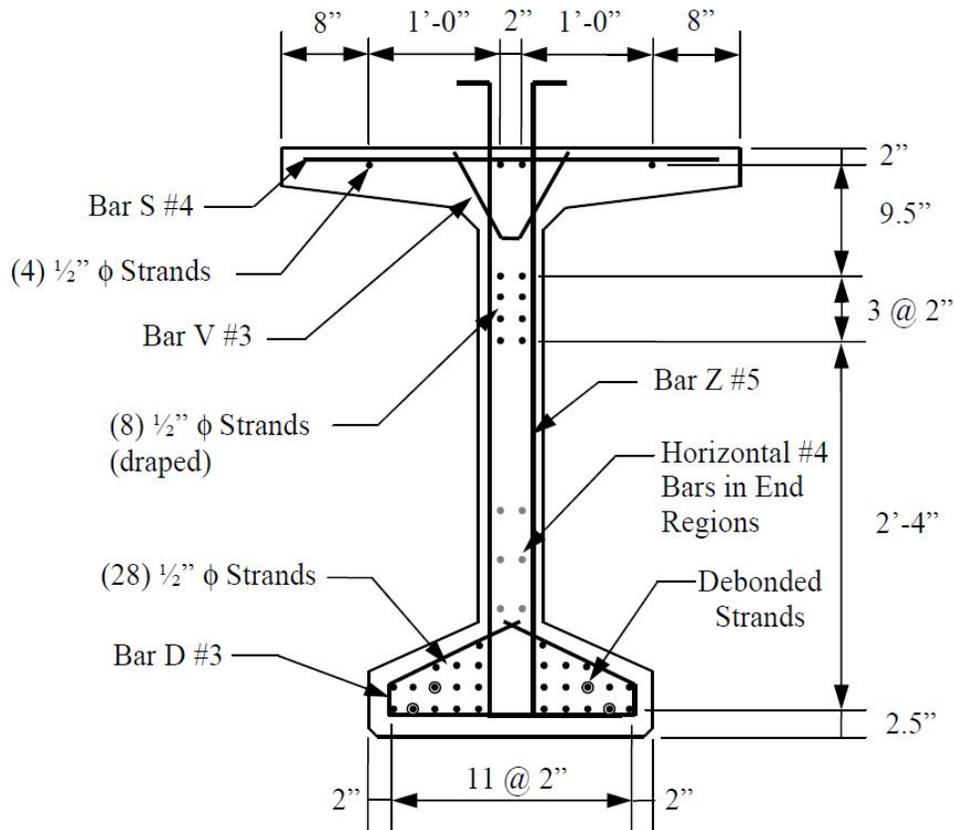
Mild steel and strand arrangement for BT-54 girder at girder ends
